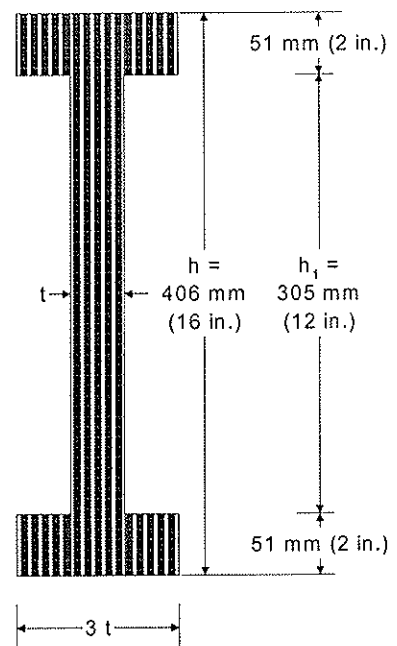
Specimen dimension used in APA full-scale edgewise shear tests (t = LVL thickness)
